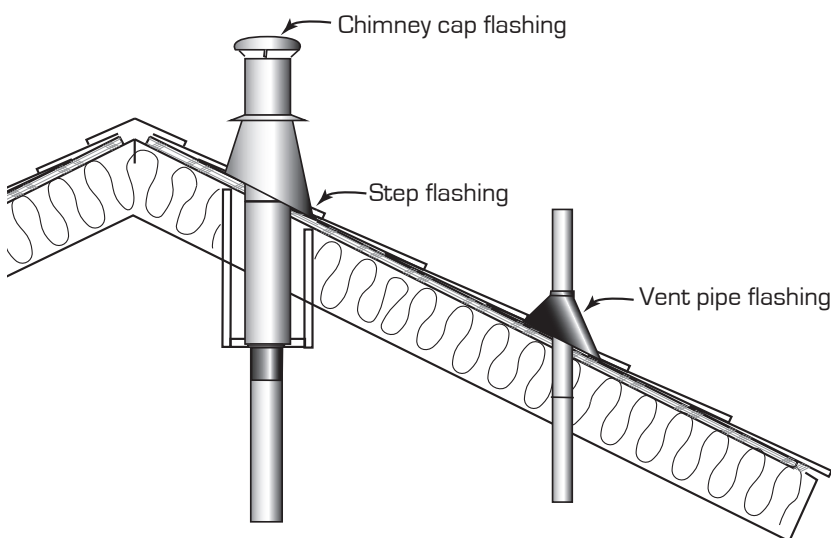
Flashing for chimneys and plumbing vent stacks.
